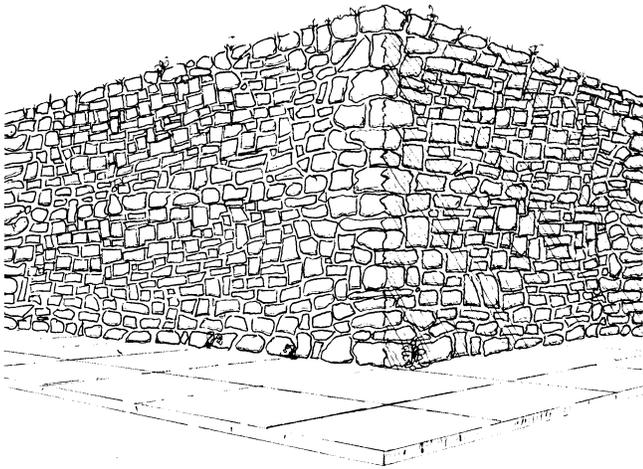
Basalt ballast wall (4) that surrounded the original St. Mary's Academy.
